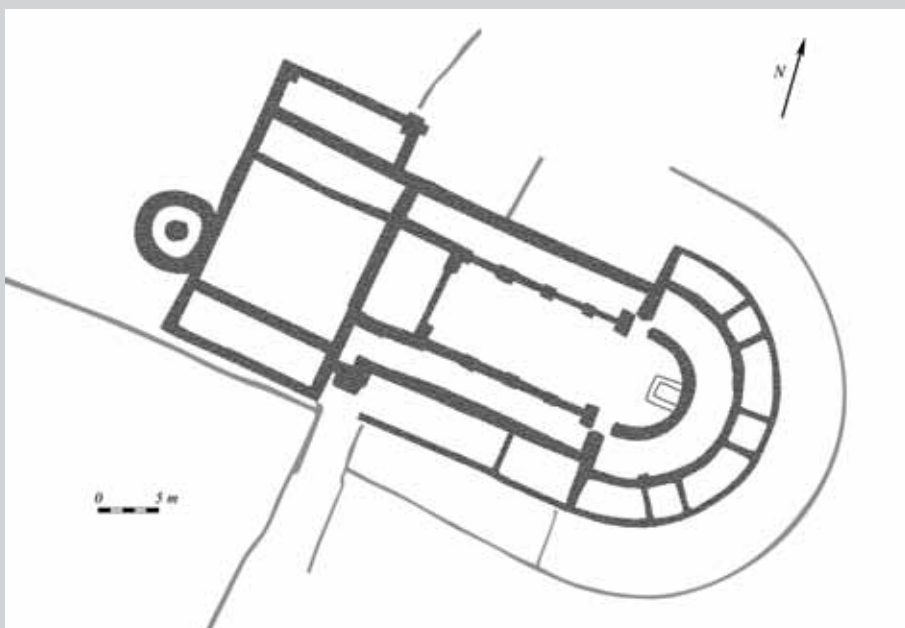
Zalavár-Castle Island. St Hadrian's pilgrimage church (photo: Tibor Bóka, 2009)
